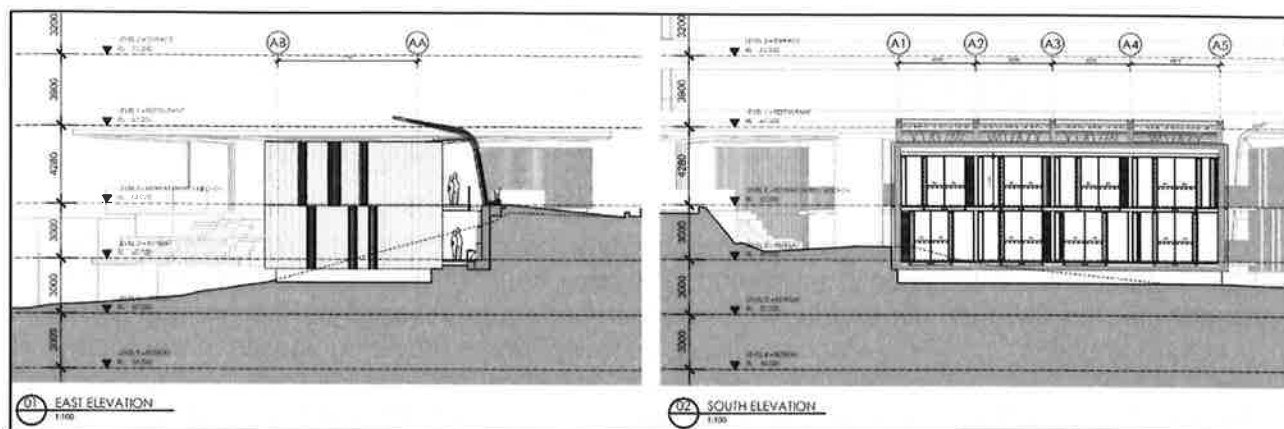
Eastern and southern elevations of two storey Pod A (Pod B is also two storeys) (Source: Architectural Plans)
